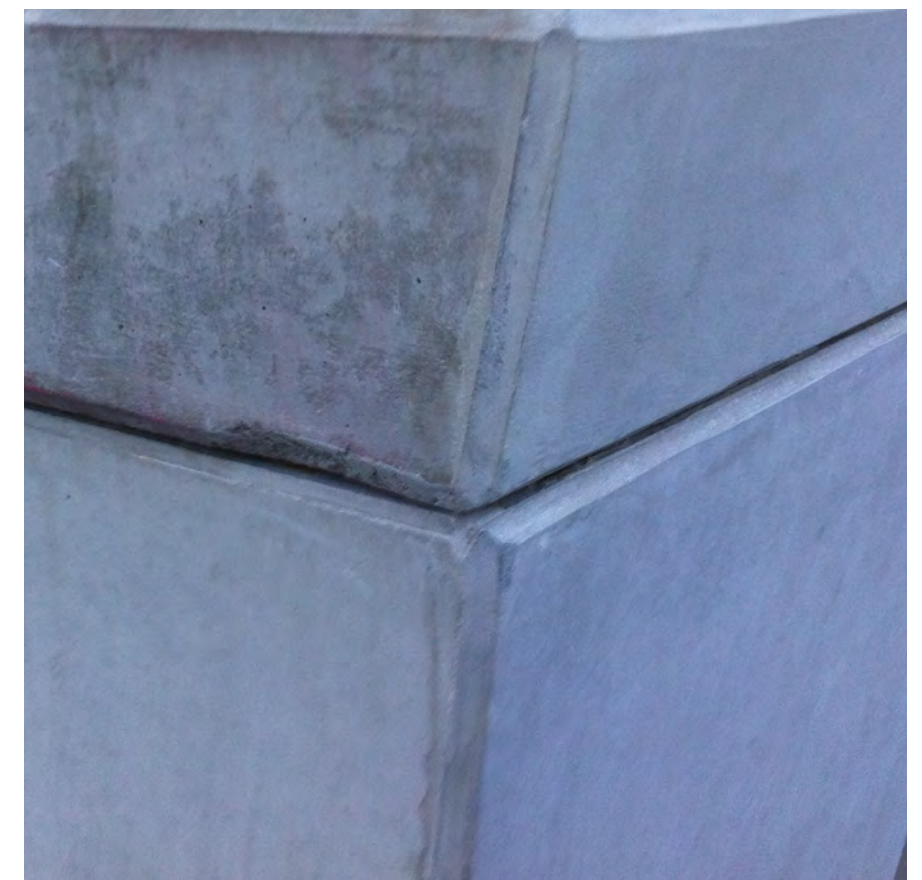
xxxiv examples of damaged (left hand side of photograph) and repaired (right hand side) concrete finishes
